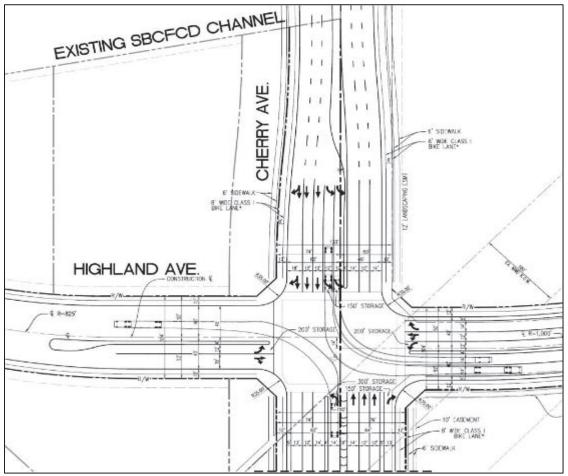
Preliminary Design Plan of Cherry Avenue and S. Highland Avenue. Source: Building a Better-Connected Inland Empire – A Complete Streets Solution, Funding Opportunity Number: DTOS59-22-RA-RAISE, Apr 14, 2022.
